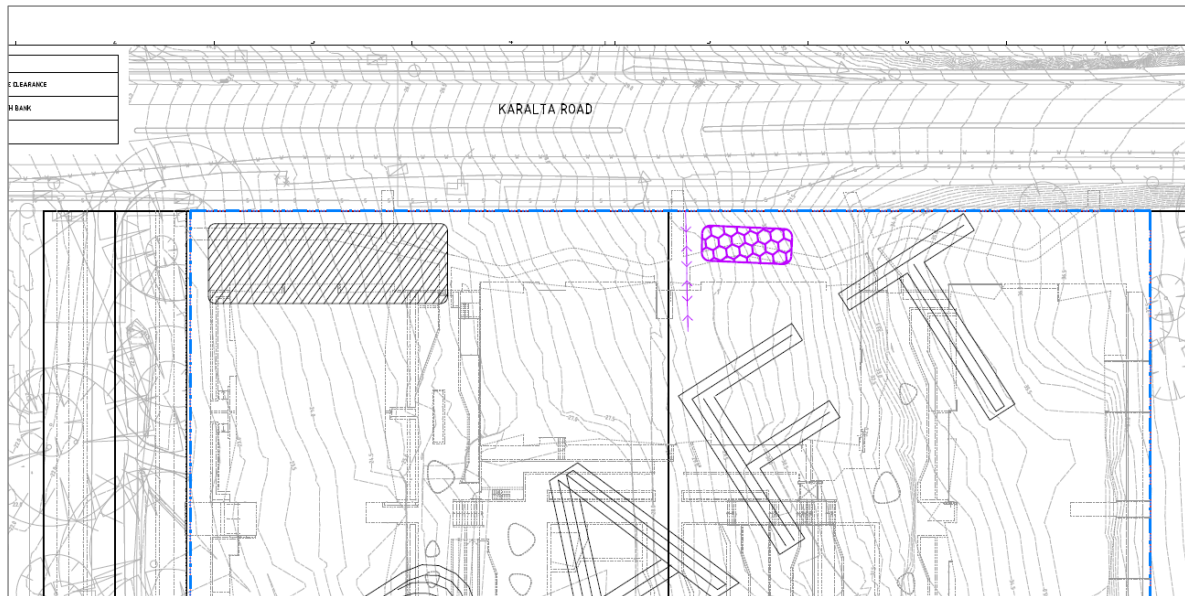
Concept Construction Management Plan Stage 3 - PS01-B102 Rev A
